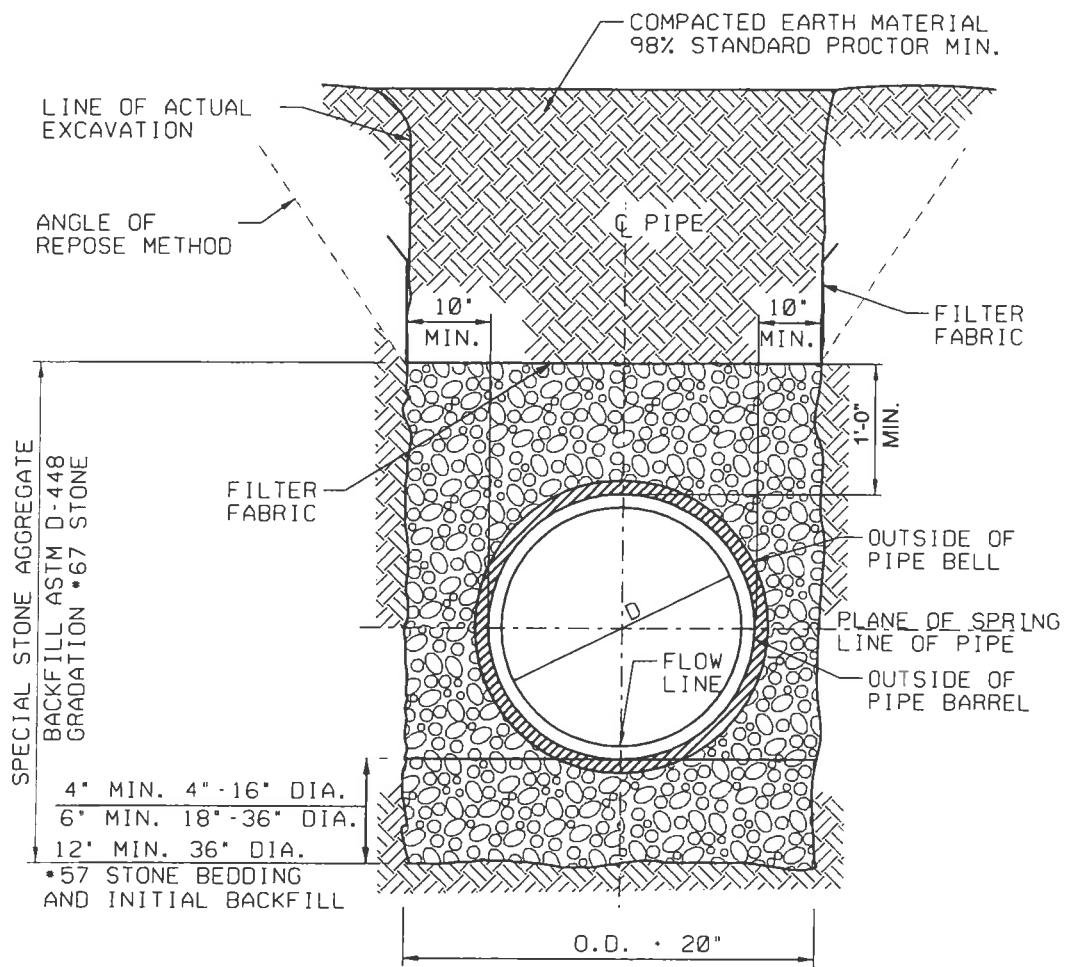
"TYPICAL" PIPE BEDDING UNDER PAVEMENT (FULL GRAVEL BACKFILL) SCALE: NONE	Alabaster
